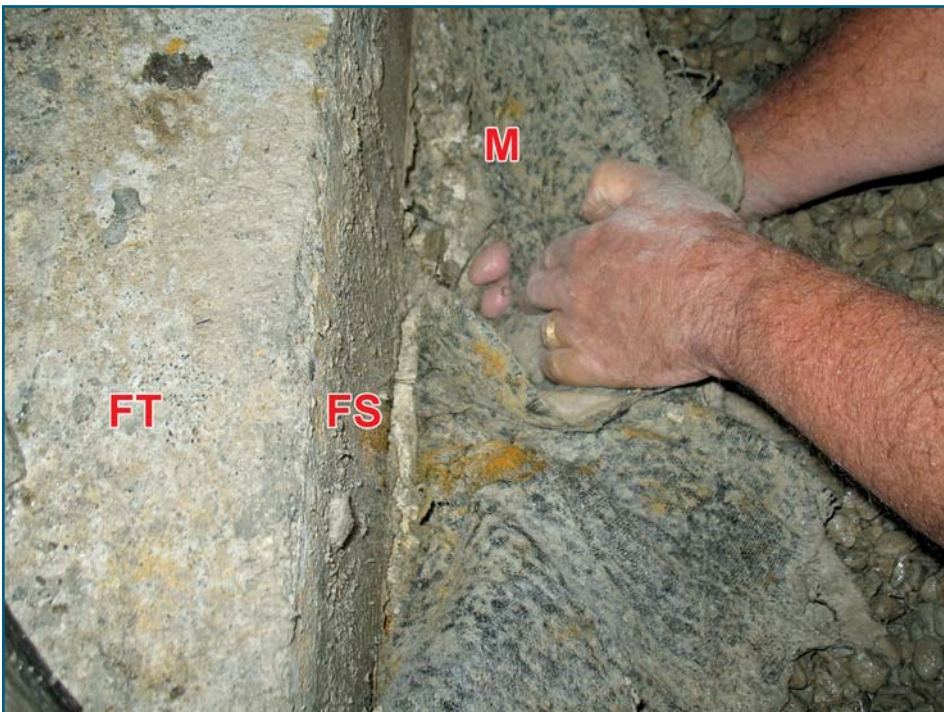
Large hole through membrane layer (M). Footing side – (FS); Footing top – (FT).
